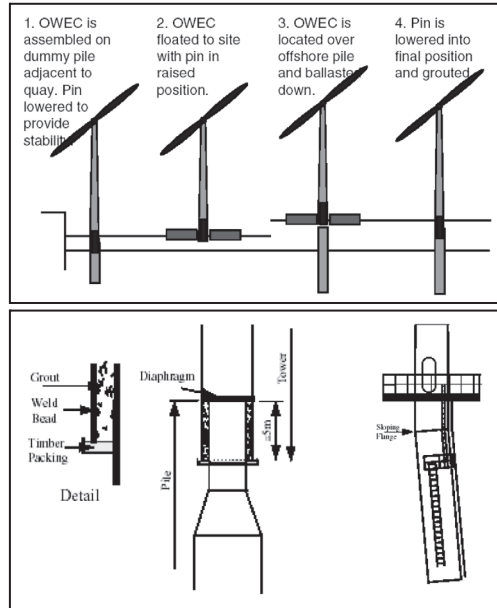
Installation of fully operational turbine and connection details between foundation pile and tower with misalignment correction.
